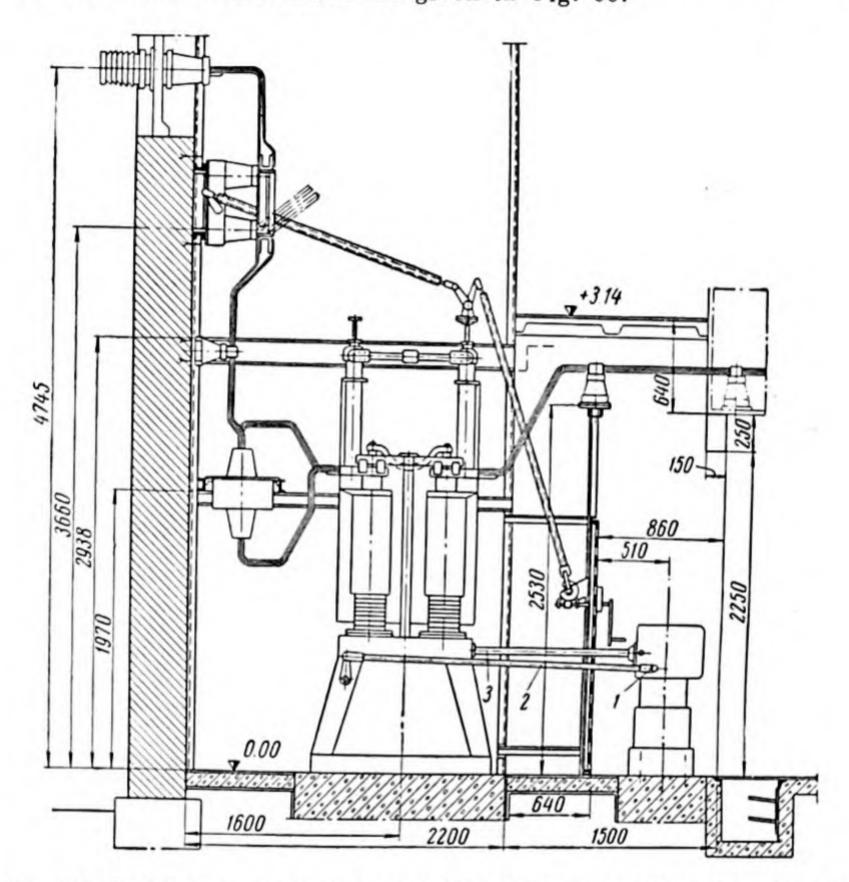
Installation drawing for the MΓΓ-299 circuit breaker and its IIC-30 operating mechanism:
